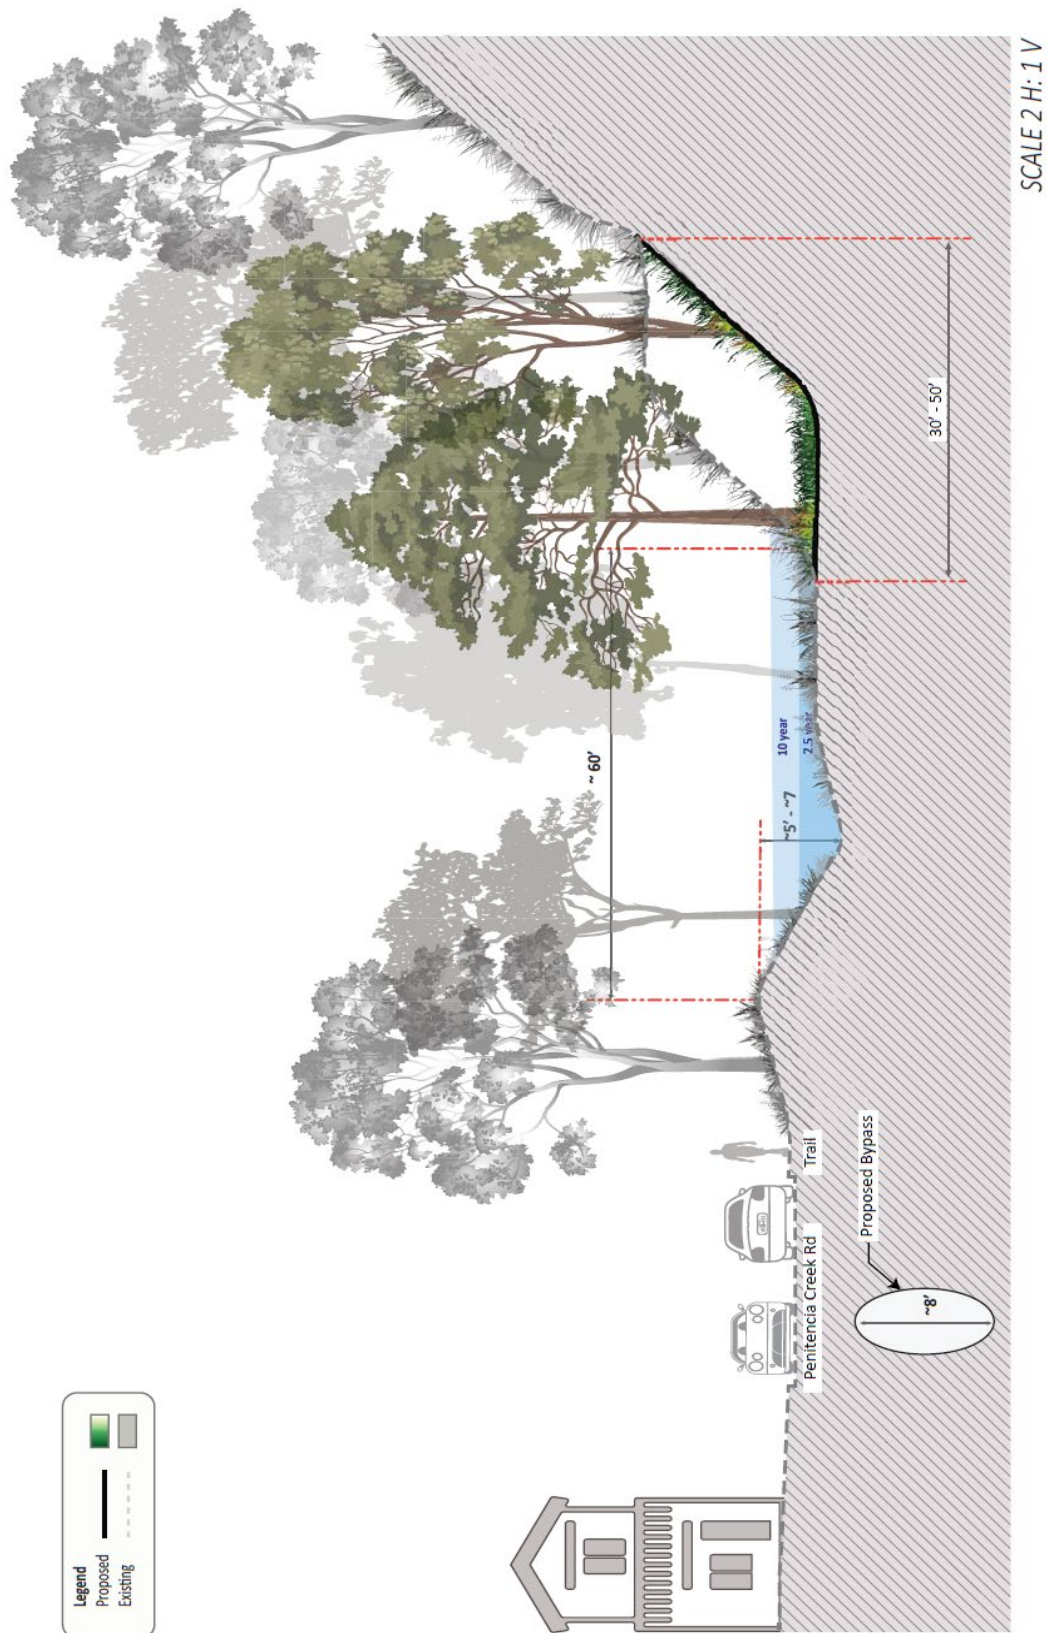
Reach 7 Cross Section (Channel Widening OR Bypass)
